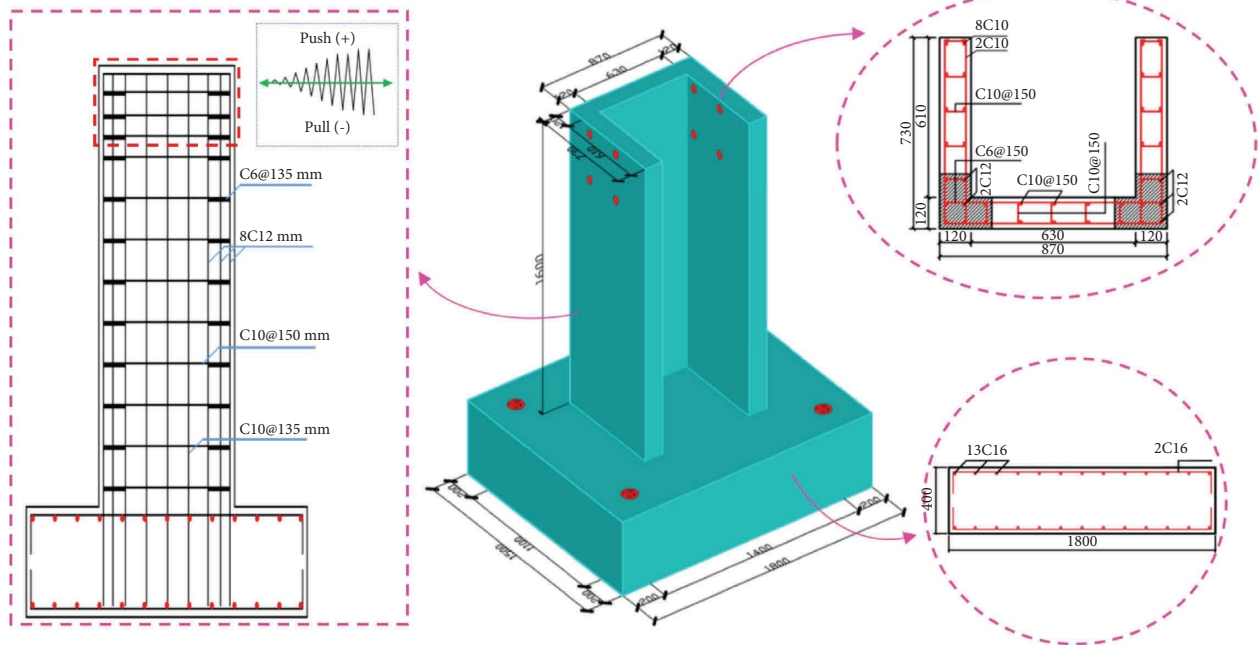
URC-X shear wall specimens and reinforcement diagram.
